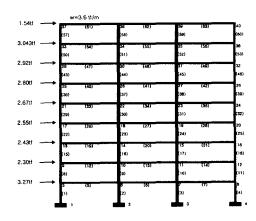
3-bay, 9-story reinforced concrete frame subject to gravity and lateral load. (span=9m, story height=3.6m)
